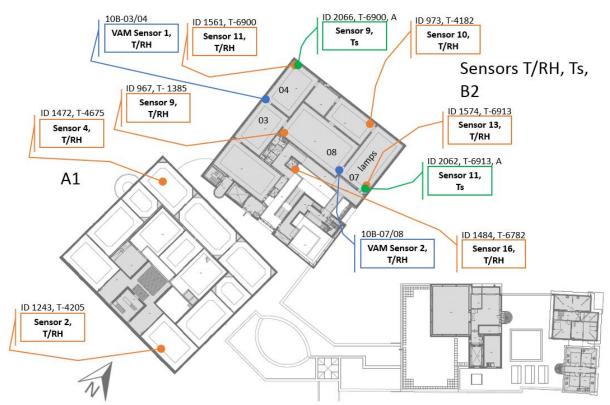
T/RH/T_s sensors, measurement locations A1 and B2, floor plan under layer by Cahen (2003).
